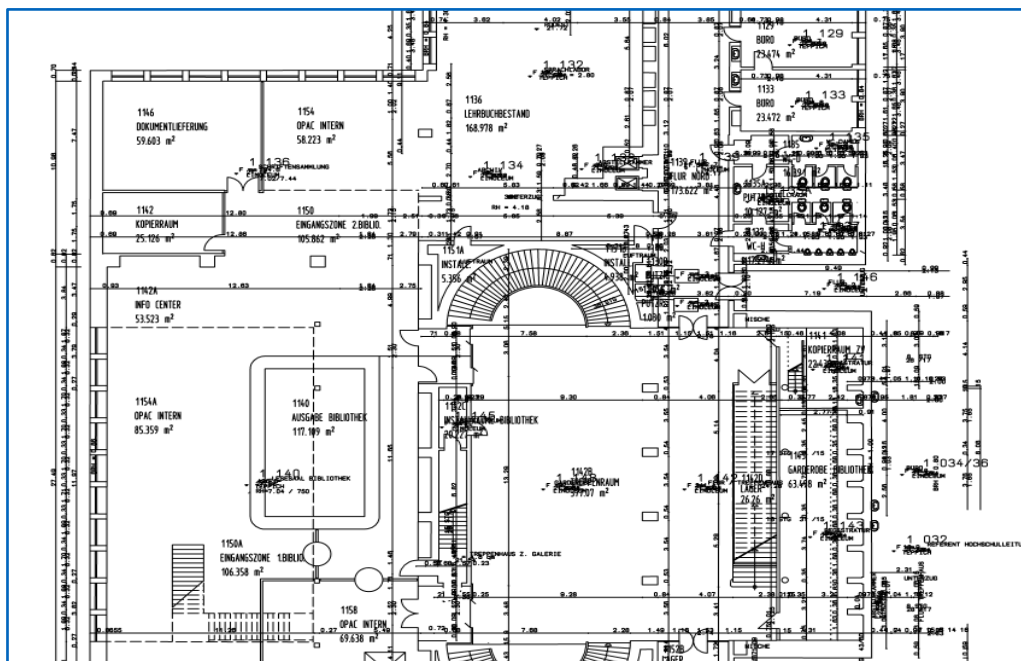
Example of a CAD file (floorplan of the 10G of the TUM main campus building)
